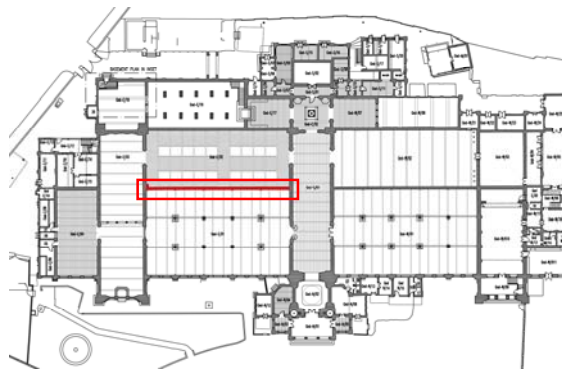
Key Plan showing wall Gnd-E/01-S-W
